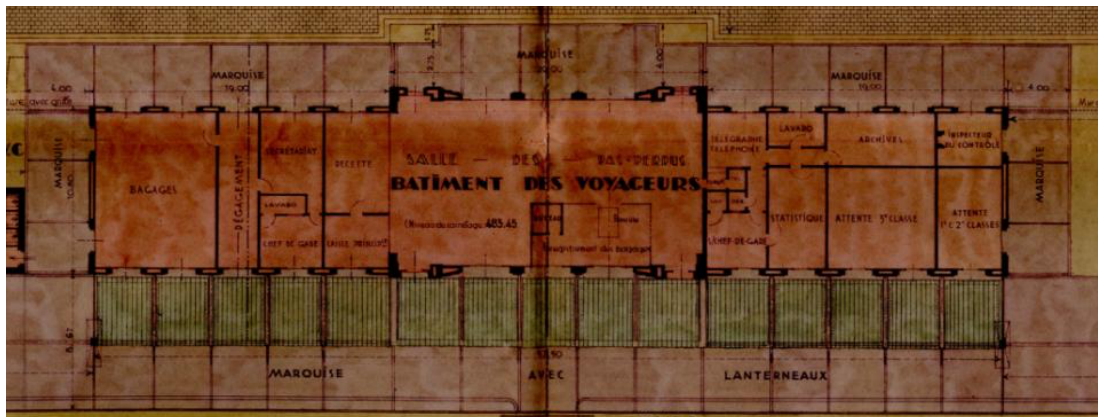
Plan of the new Sidi-Bel-Abbès passenger building, 1932. (Archive of Railway Transport)
